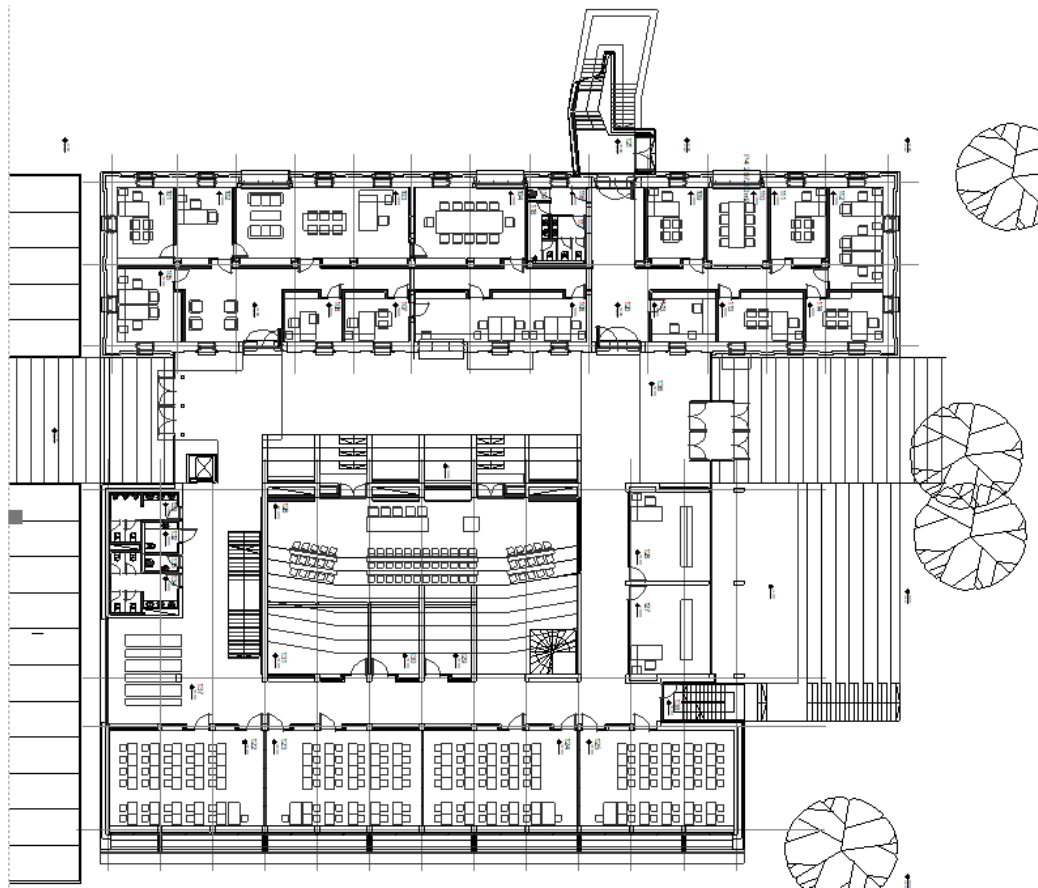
Ground level plan - vertical communications outside the building in the old part of the building on the left and flexible classroom space in the new part of the building on the right (Photo by author)
